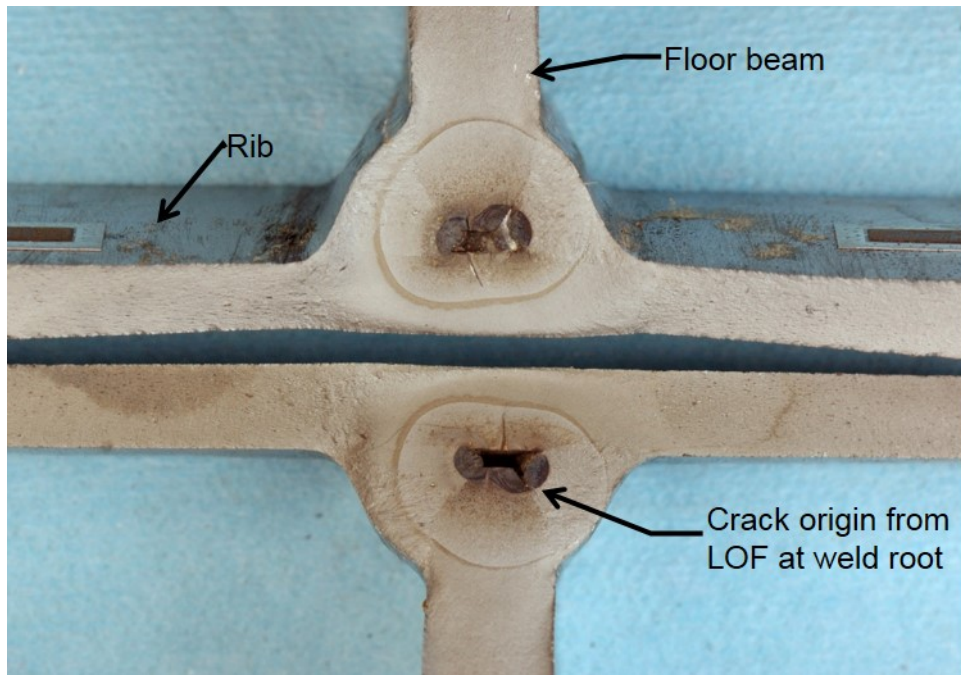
Mating fatigue fracture surfaces for the crack to the north of rib in MU3
